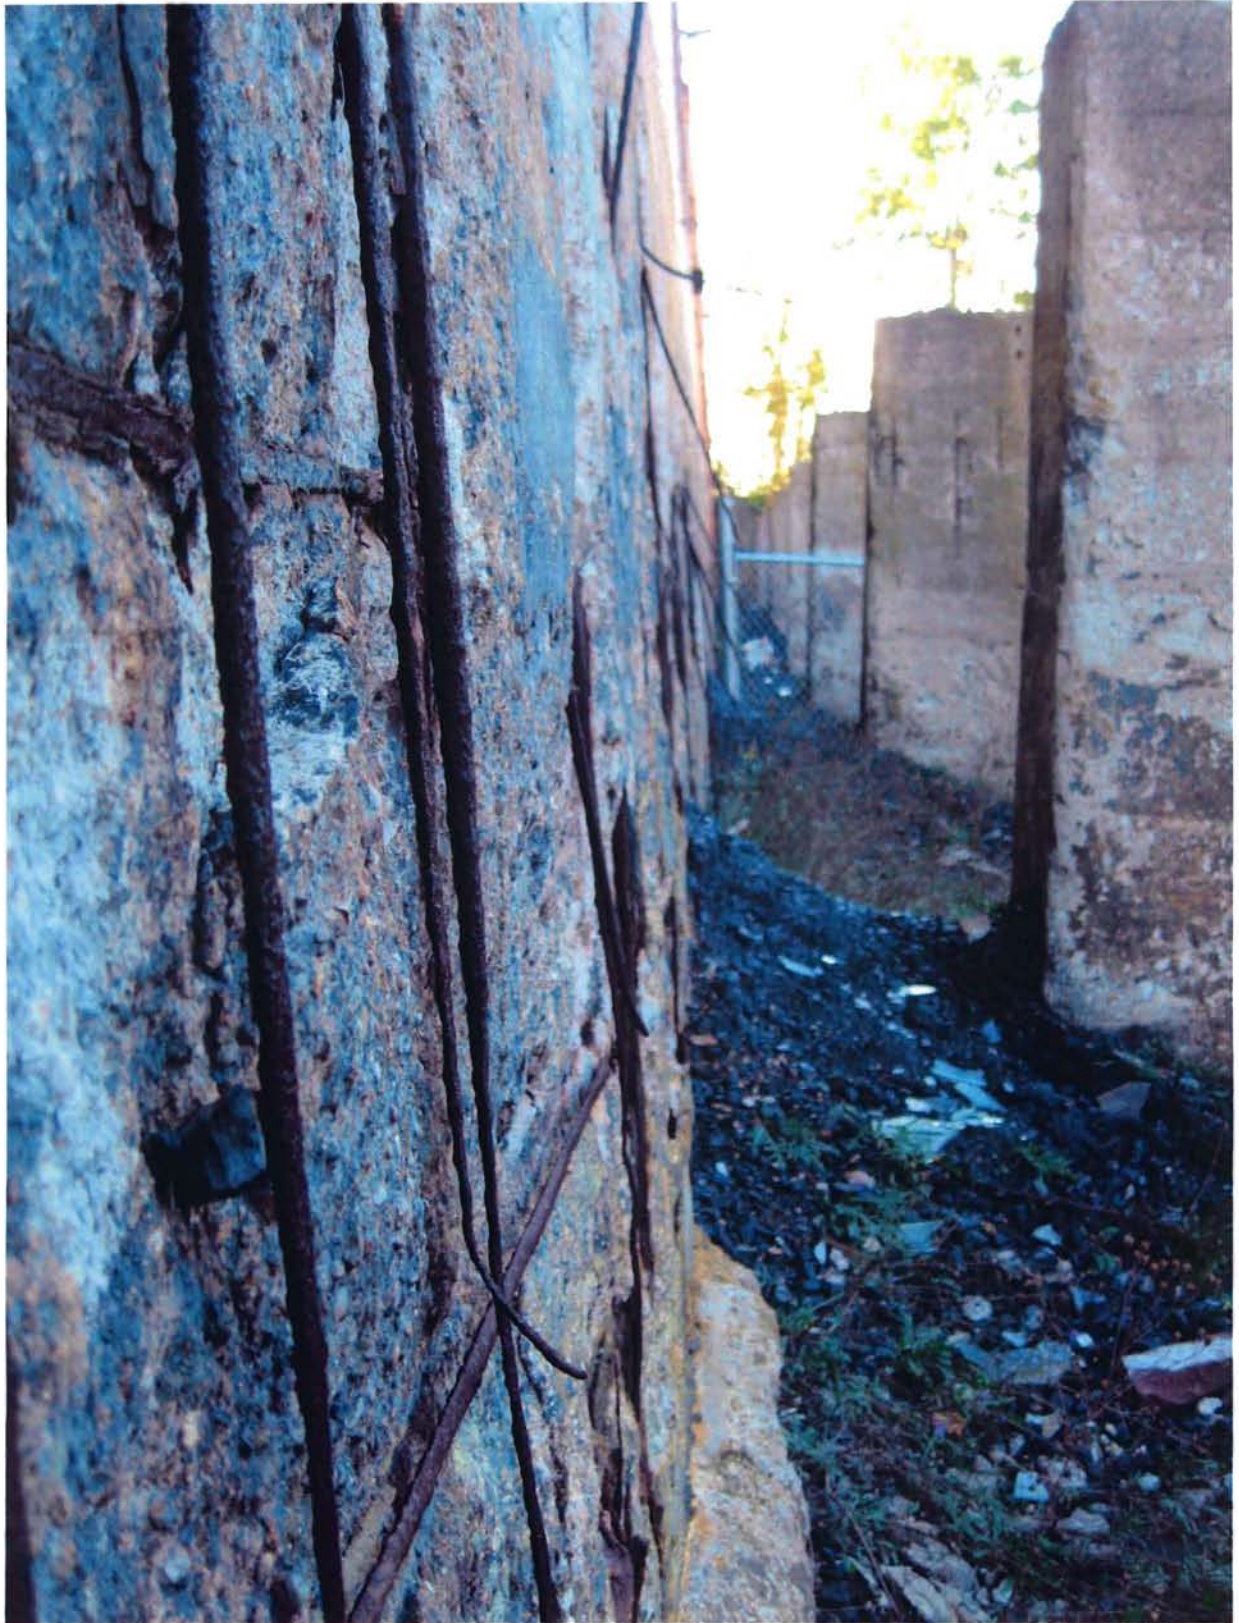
Exposed concrete reinforcement in the Power Plant's bridge
